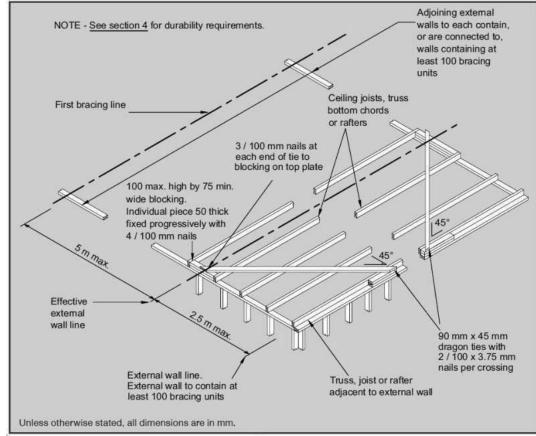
Connecting top plates to external walls at right angles - Walls containing bracing (see 8.7.3.4)
